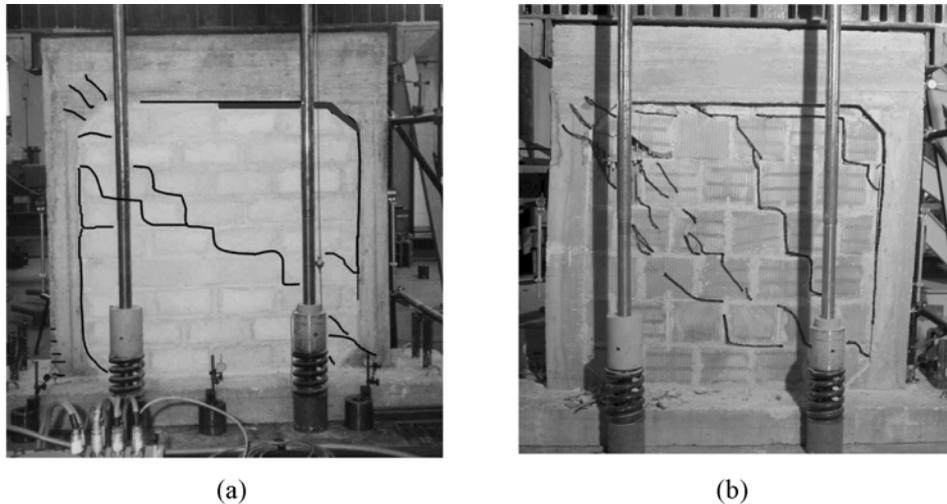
Specimens after the monotonic loading tests (a) infill made of calcarenite masonry, (b) infill made of clay tile masonry
